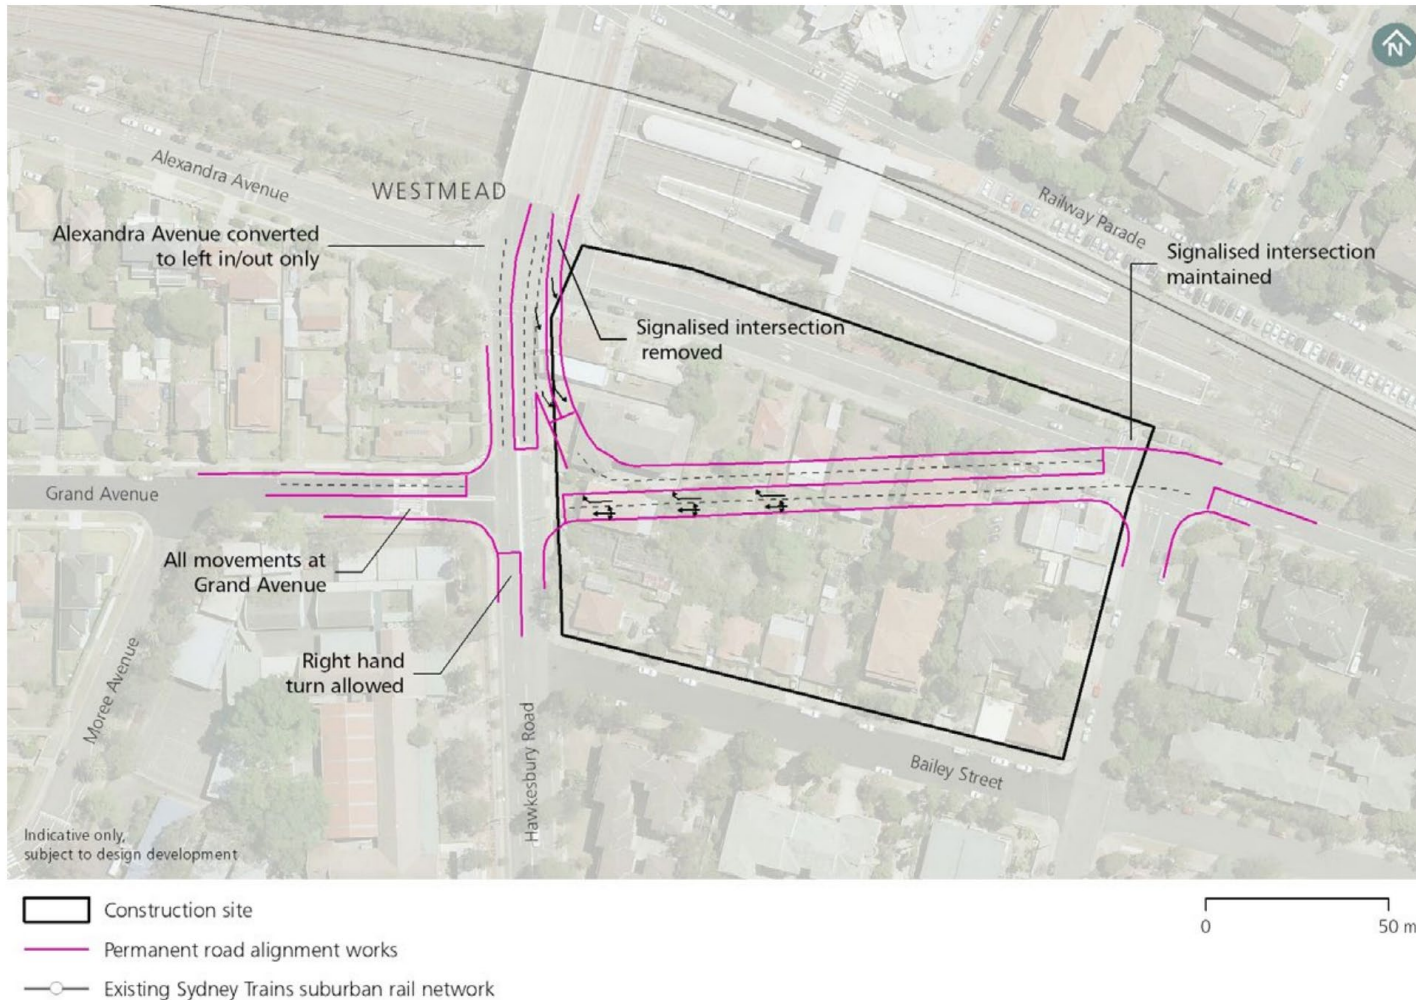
Westmead road realignment works (Source: EIS Figure 9-13)
